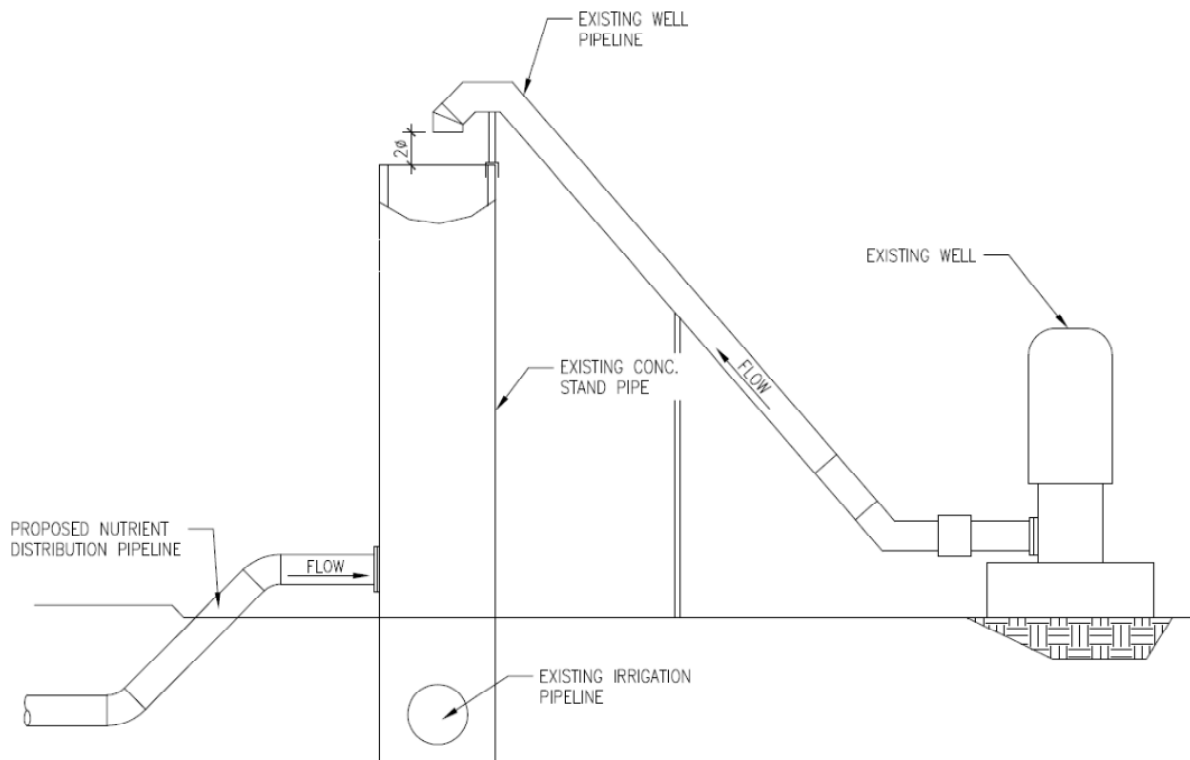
Mixing station layout with air gap to prevent contamination of well.
